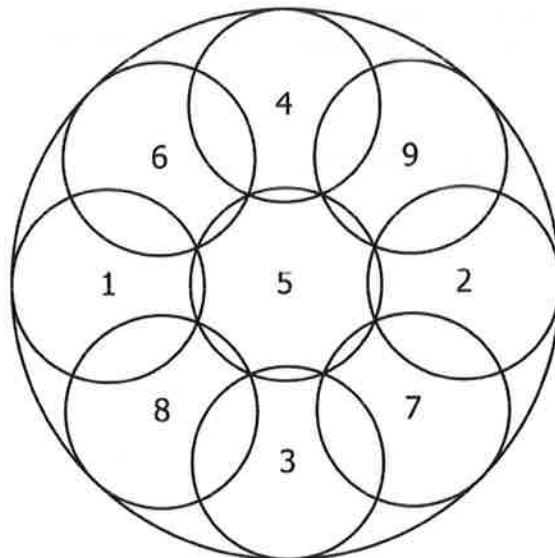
Rammer Pattern for Compaction in 6-in. (152.4-mm) Mold
